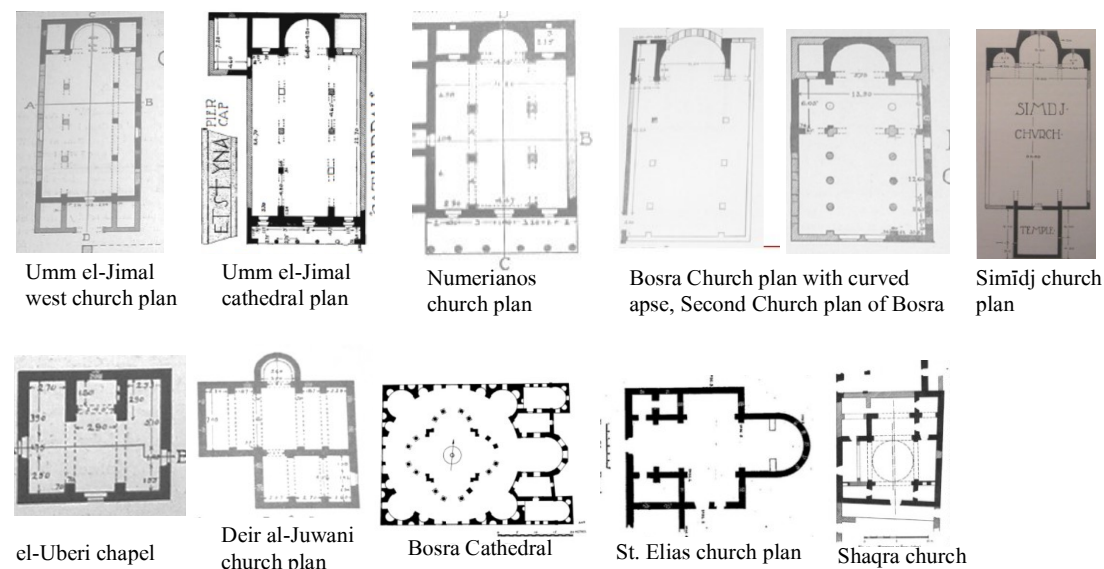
Church Plans in the Sixth Century in Southern Syria, by the author
